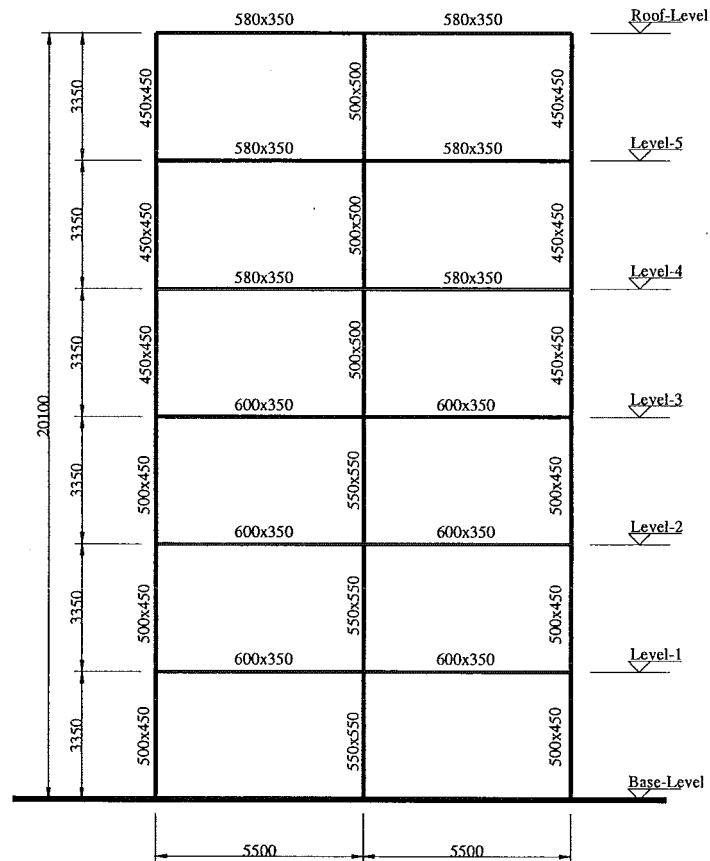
Jury two-bay six-storey ductile-framed structure of reinforced concrete
